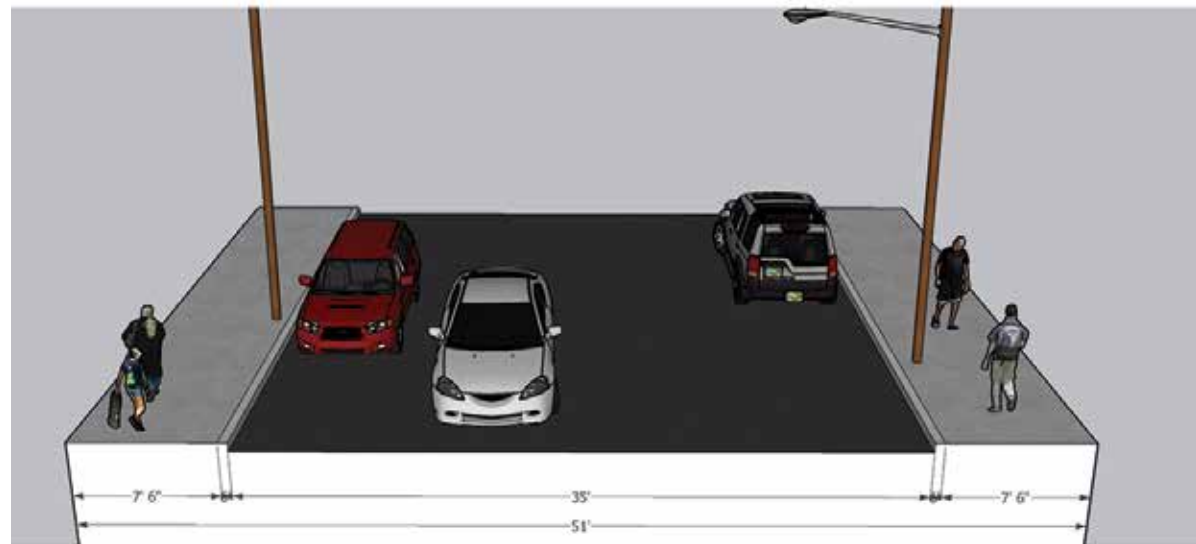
Crane Street : Broadway to Yorkston St Design Concept Cross-Section
